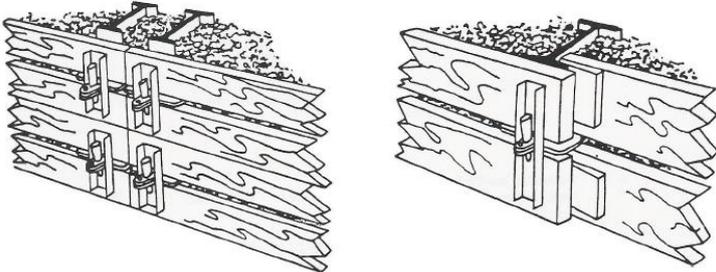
Joint between lagging (Wylaers M., 2016, *Bouwtechniek 1 – Berlin walls*)
